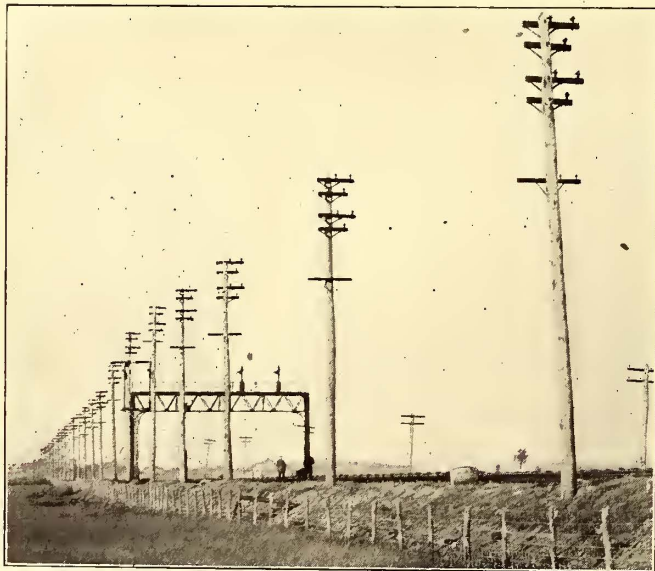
WOOD POLE CONSTRUCTION, LOOKING NORTH FROM JAMAICA BAY
